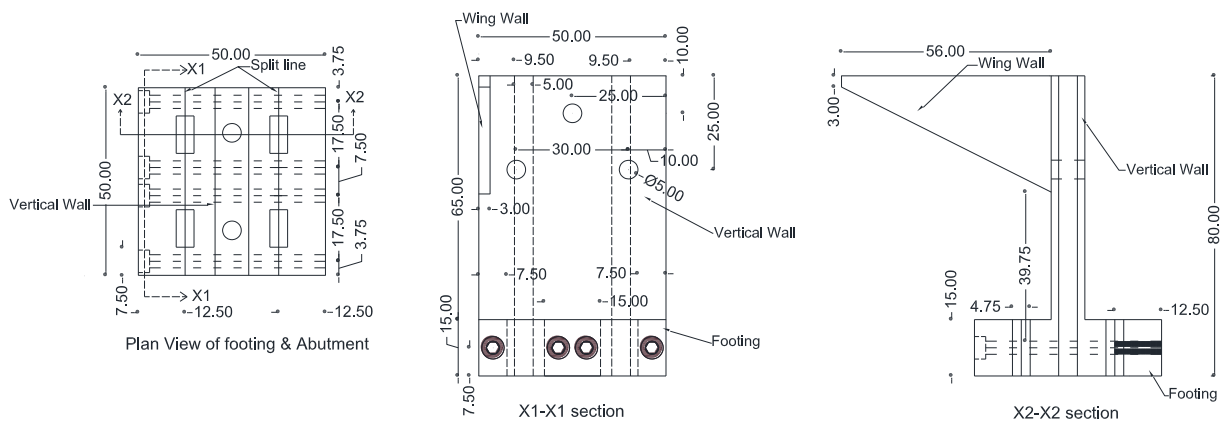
Plan and cross-sections of the model abutment (all the dimensions are in mm in model scale).
